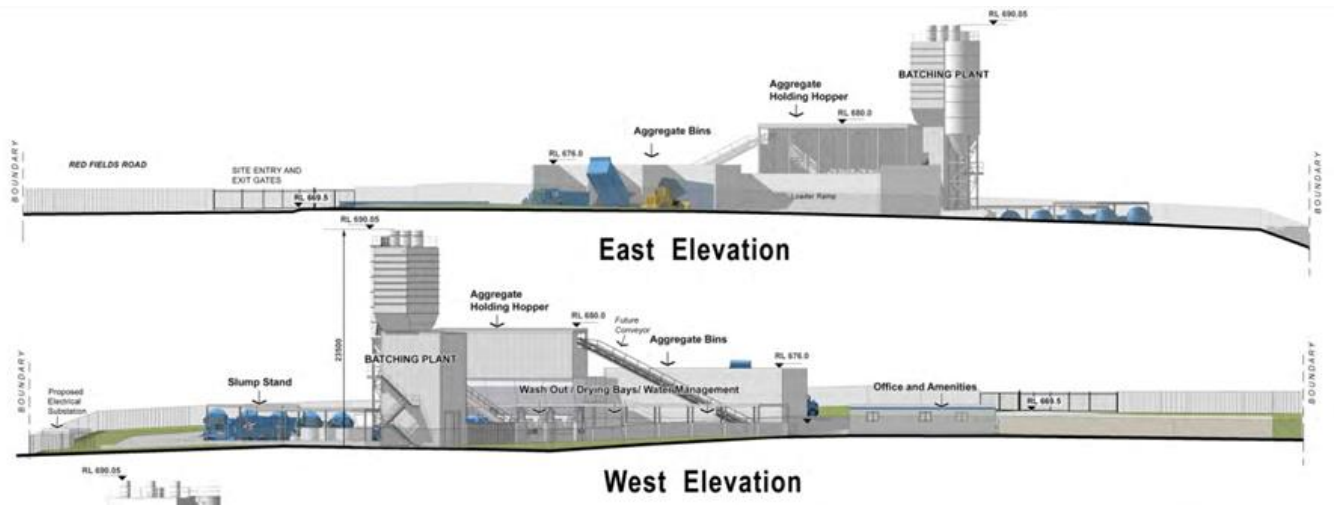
Elevations (Source: Maurice Hayler Archtypal Graphics)
